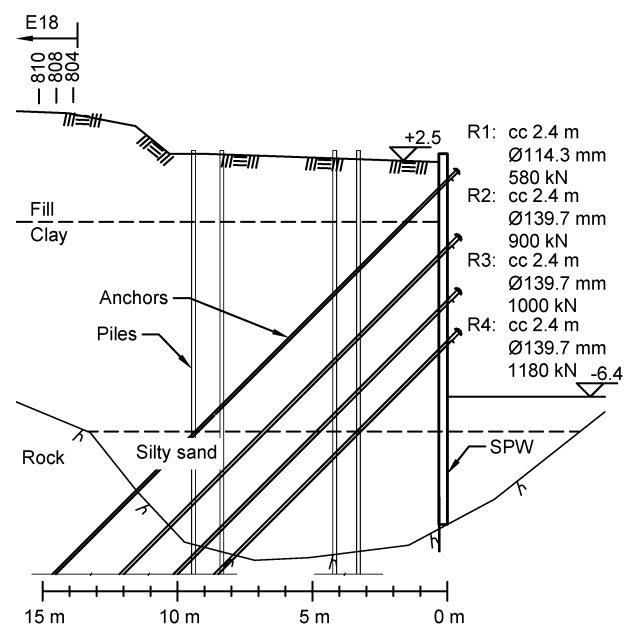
Cross section B-B from Sandene et al. (2021) including soil layering, tieback anchors, piles and settlement surveying points at the E18 road.
